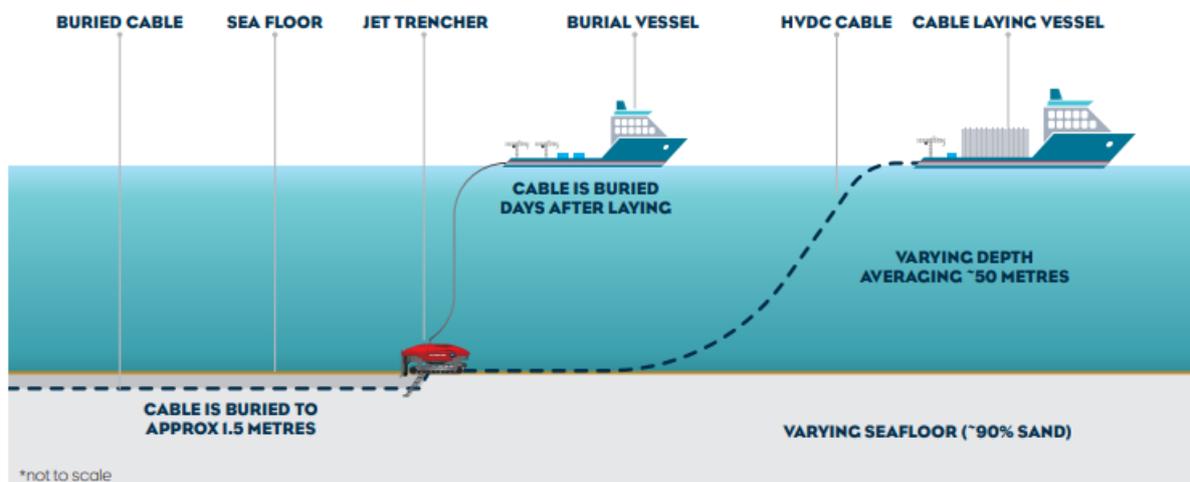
Diagram outlining the basic method for laying and subsequent burial of cable through Bass Strait.
